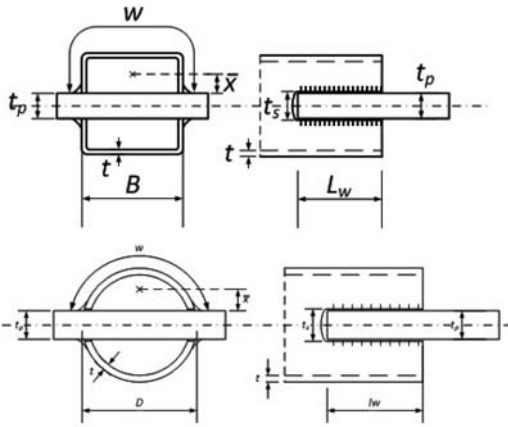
Schematic view for the gusset plate welded slotted end connections for box and circular section members.
